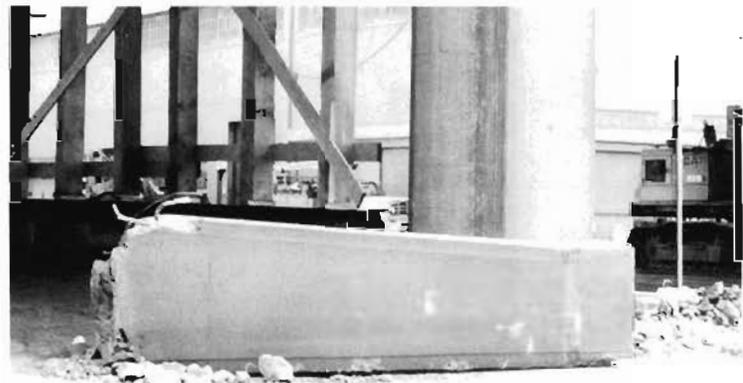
Nearly undamaged upper west column of Bent 71 on the ground
